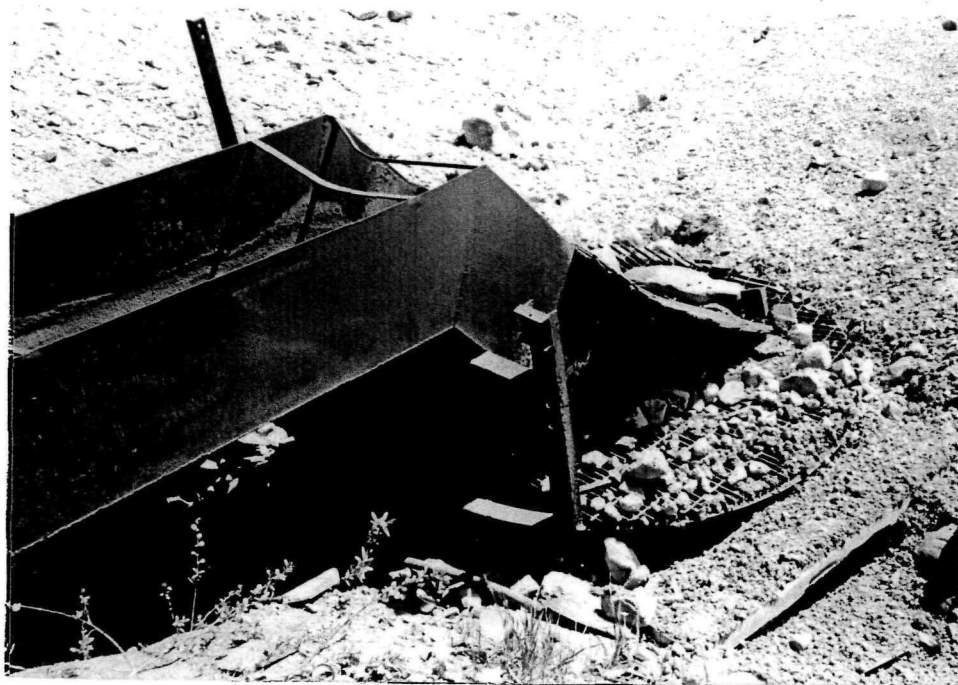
Emergency bypass for American Tunnel Treatment Plant
